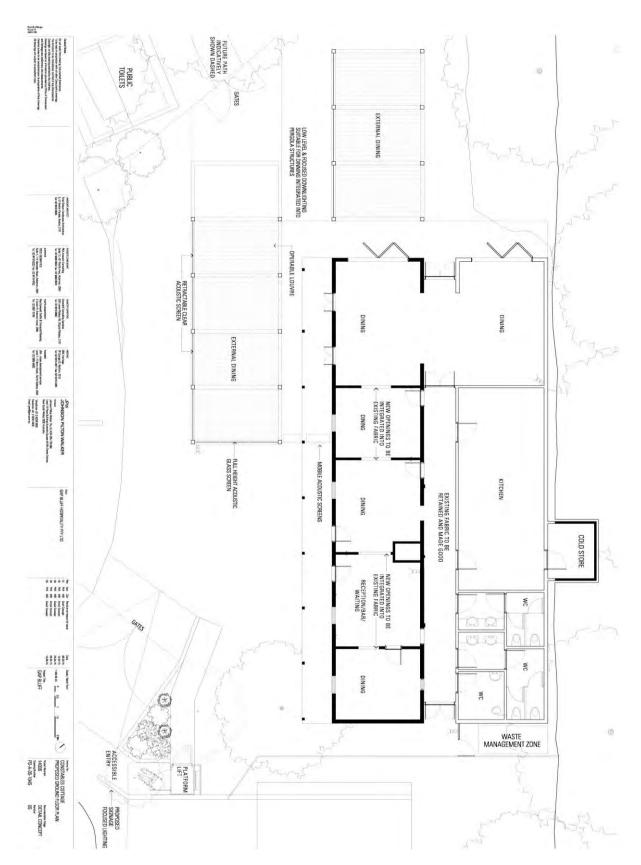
Proposed new floor plan, showing proposed additions and alterations to Constable's Cottage. (Source: JPW 2015)
